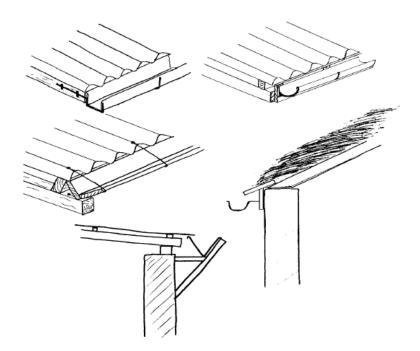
Sketches of Rainwater harvesting roof system (Source: Practical Action, 2008)
